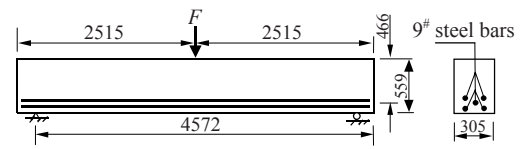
RC beam OA-2 for multiple crack propagation modelling (unit: mm)
